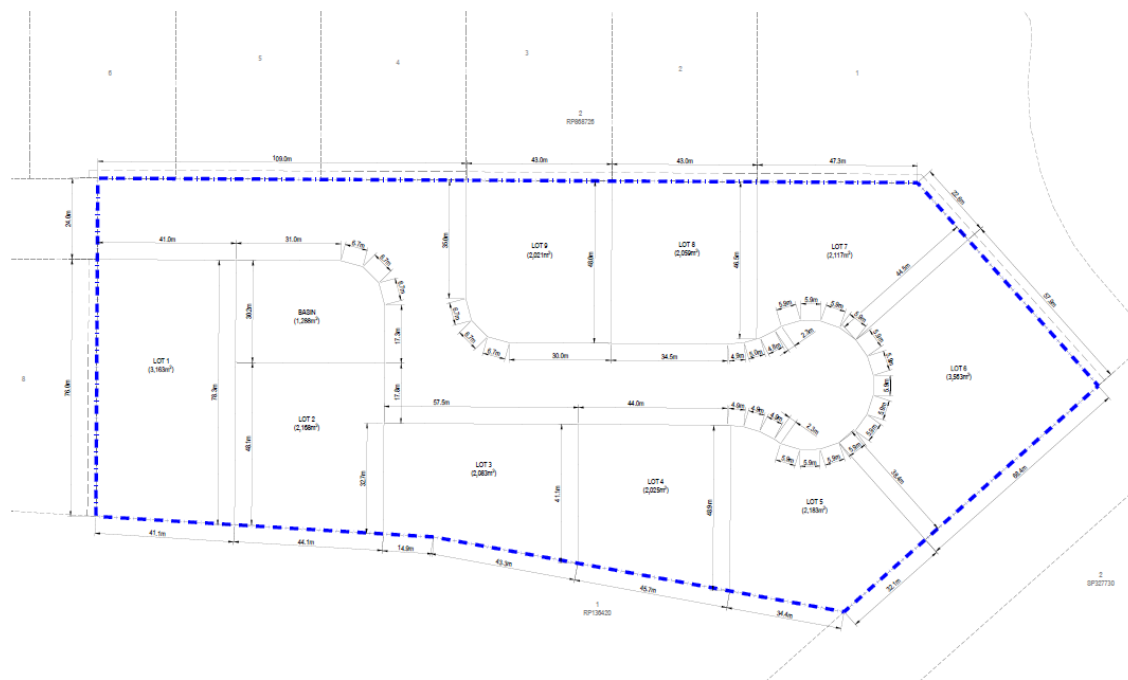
Proposed Plan of Development (Source: Appendix A)
